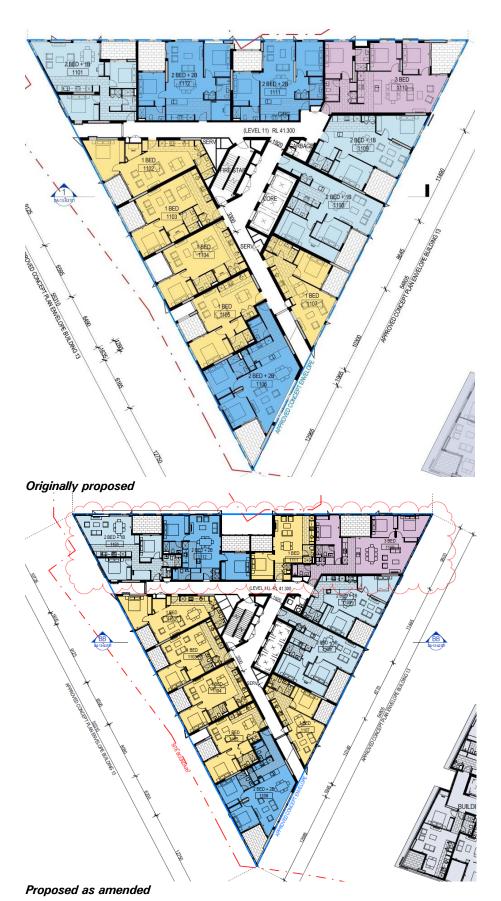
Comparison of amended Building 13 floor plate (Level 11-15)
